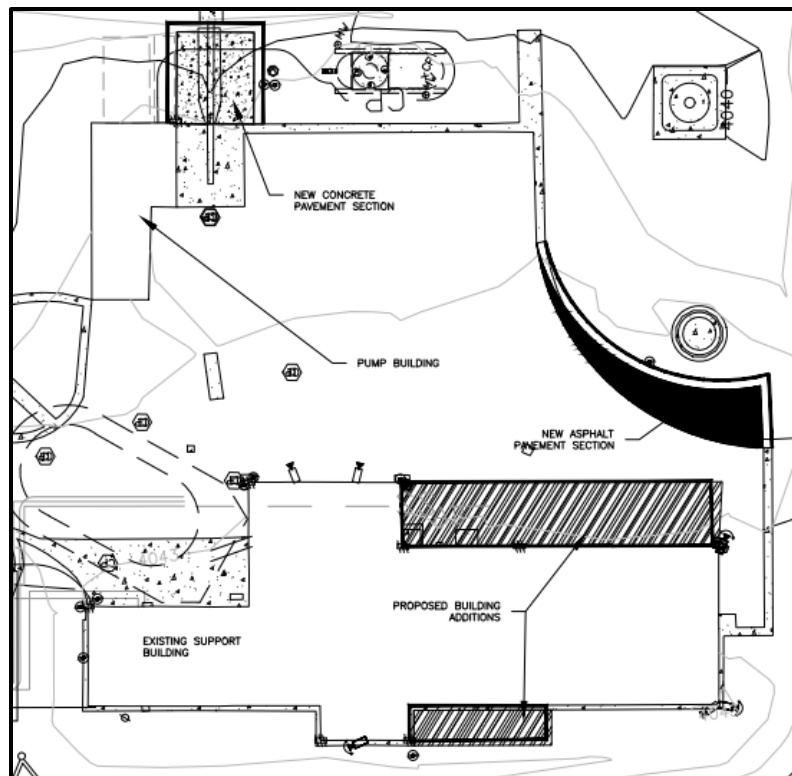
Proposed Support Building and Parking Lot Expansion Areas for MAF B-01.
